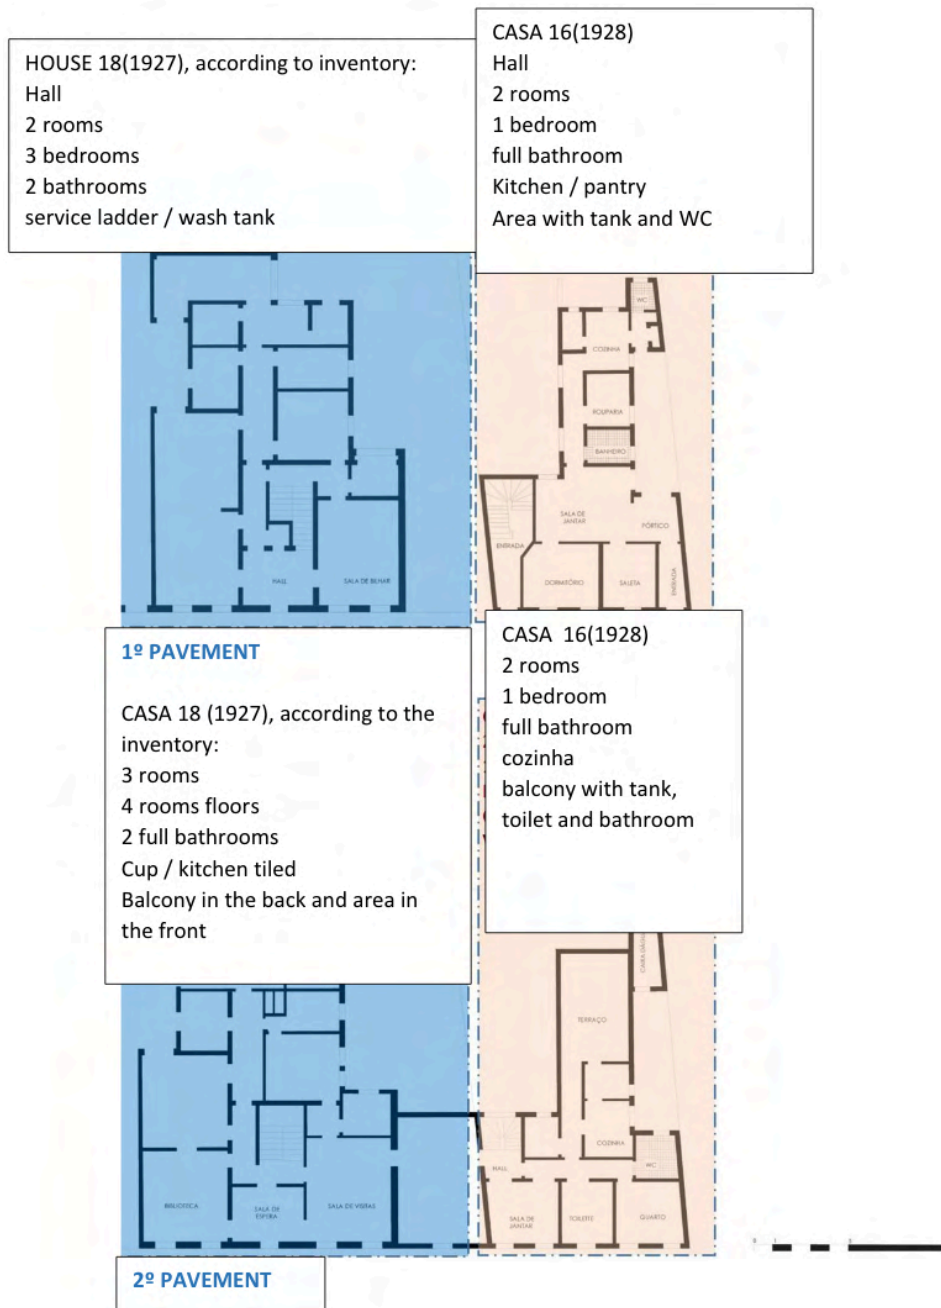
Floor plans of the Residence consisting of houses nos. 18 and 16.
